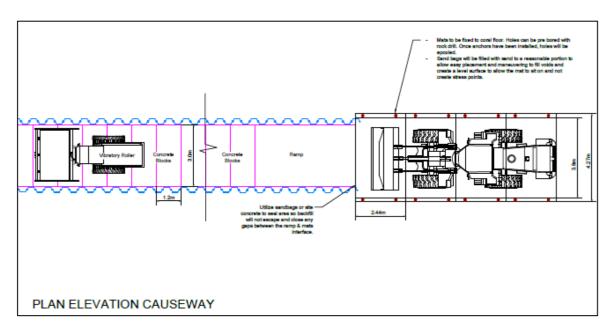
DURA-MATS, Sheet Piles & Concrete Block Hybrid Causeway Design Details - Plan View
